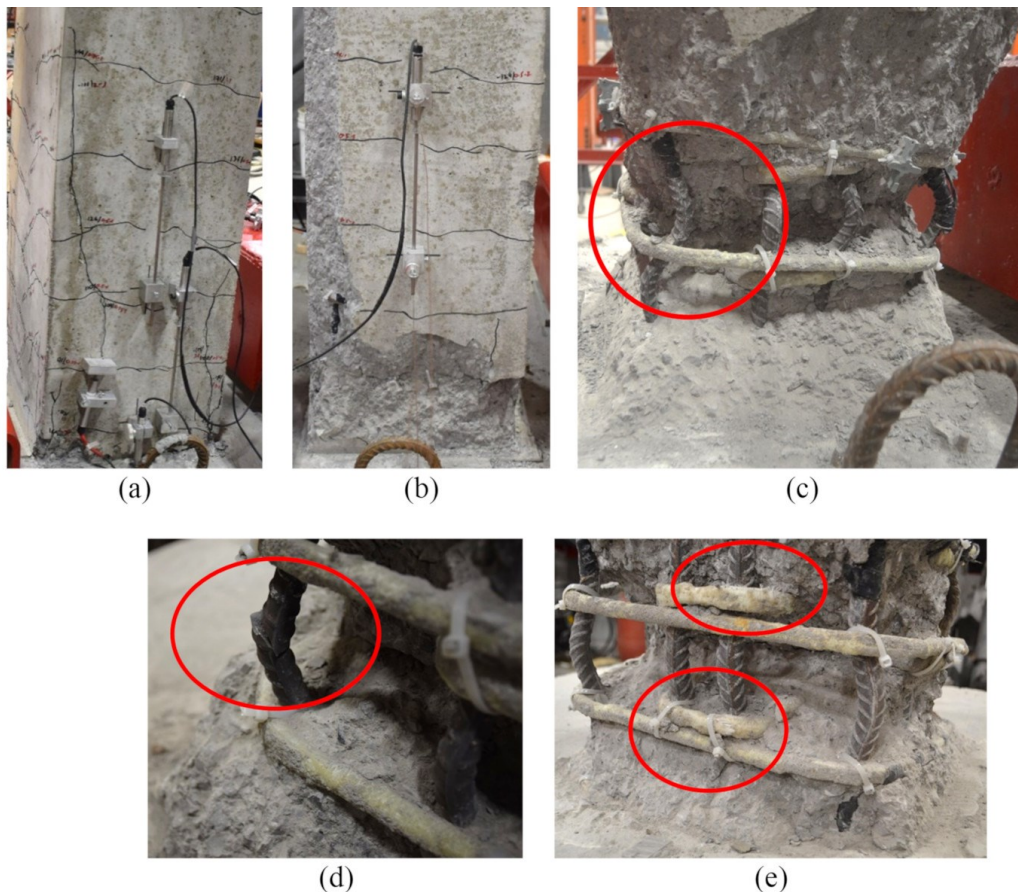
Failure progression of hybrid reinforced concrete columns: (a) vertical splitting; (b) cover spalling; (c) inward buckling of longitudinal rebar; (d) longitudinal steel rebar failure; and (e) rupture of GFRP cross tie
